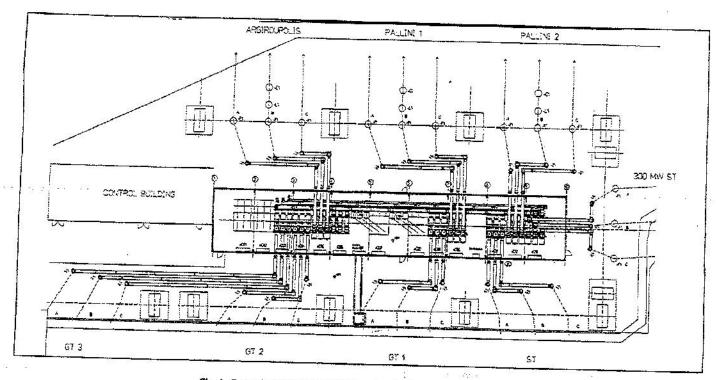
General layout of the 400 kV gas insulated switching station at Lavrion
